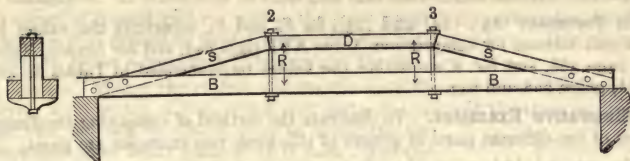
Trussed Wooden Girder. Two Vertical Ties
